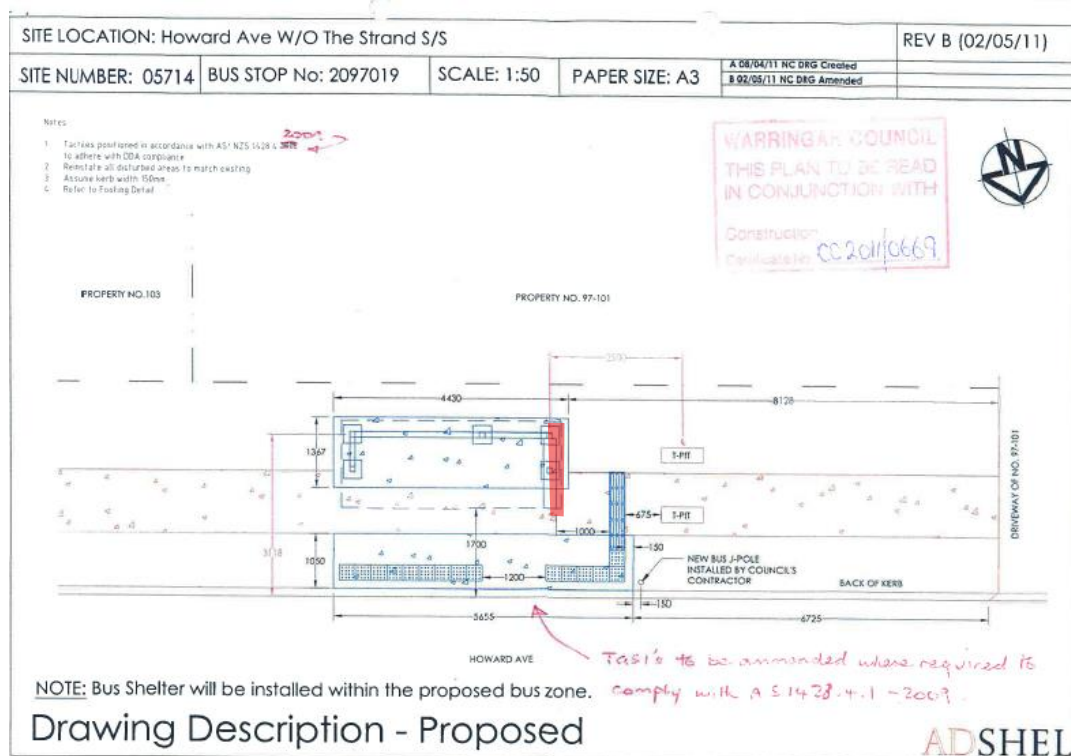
Shelter K4 CC2011/0669 Stamped Site Plan with location of sign panel shaded red
